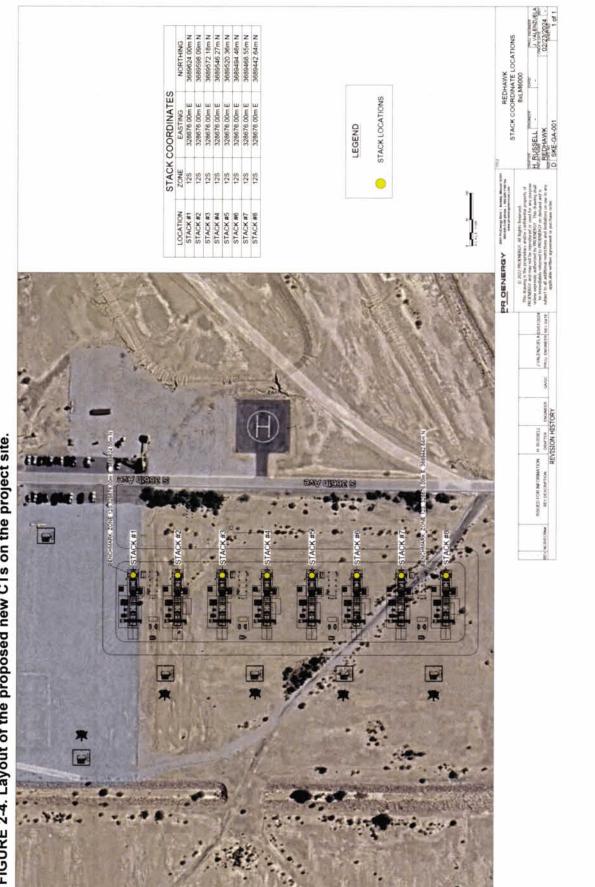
Layout of the proposed new CTs on the project site.
